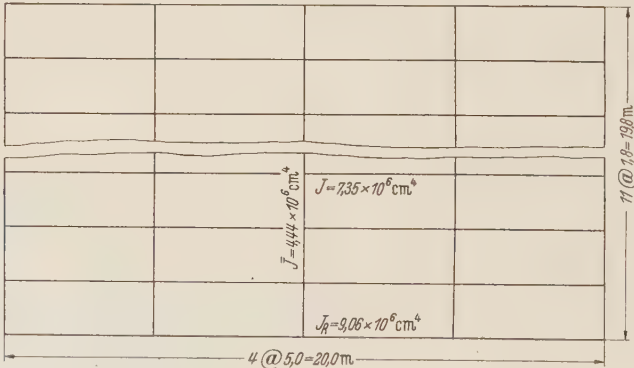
Arrangement of Main Beams and Cross Beams of the Shigita Bridge.
